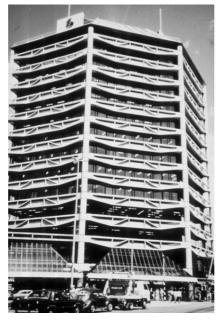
Precast concrete perimeter frame in a building in New Zealand with seismic forces resisted mainly by an interior core of cast-in-place concrete structural walls (Courtesy of R. Park)
